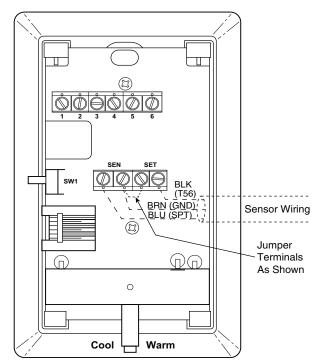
Space Temperature Sensor Typical Wiring (33ZCT56SPT)
